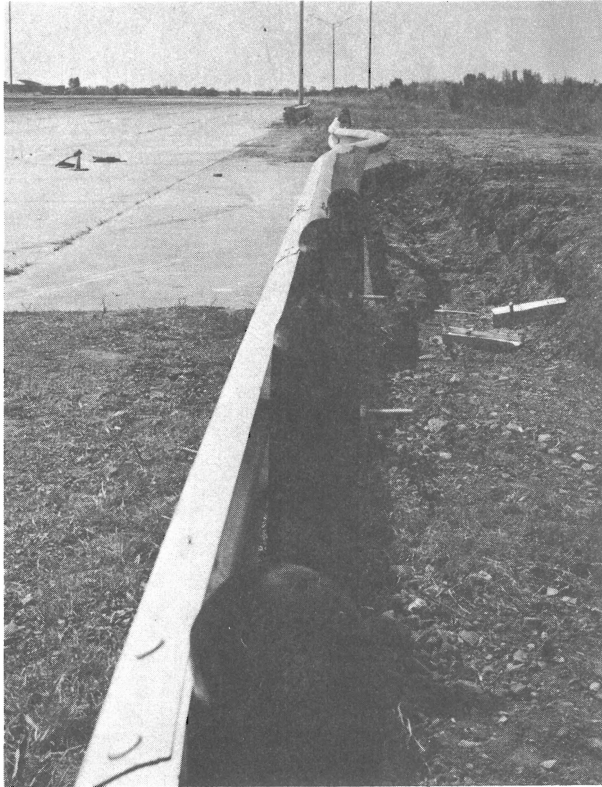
TUBULAR W-BEAM Bridge Rail after Crash Test 1B.
